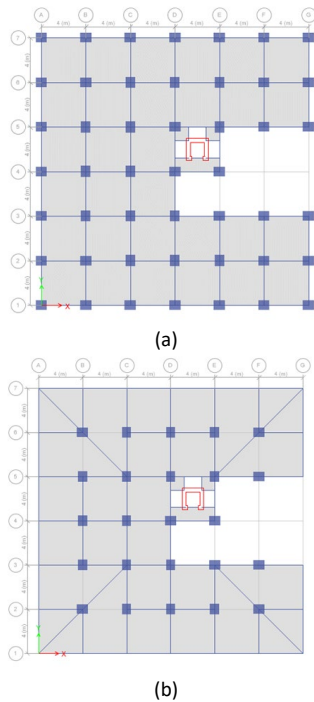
(a) Plan view (a) Rigid Frame Building (b) Diagrid Building
